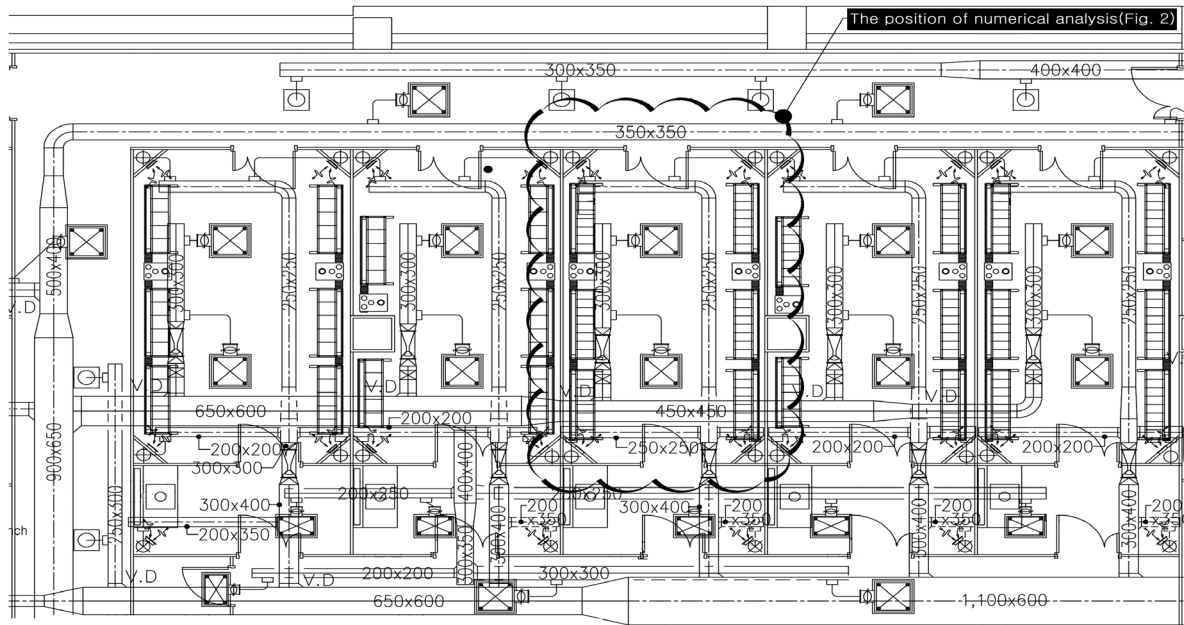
The laboratory animal facilities floor plan of green biotechnology cleaner breeding center in S-univ.
